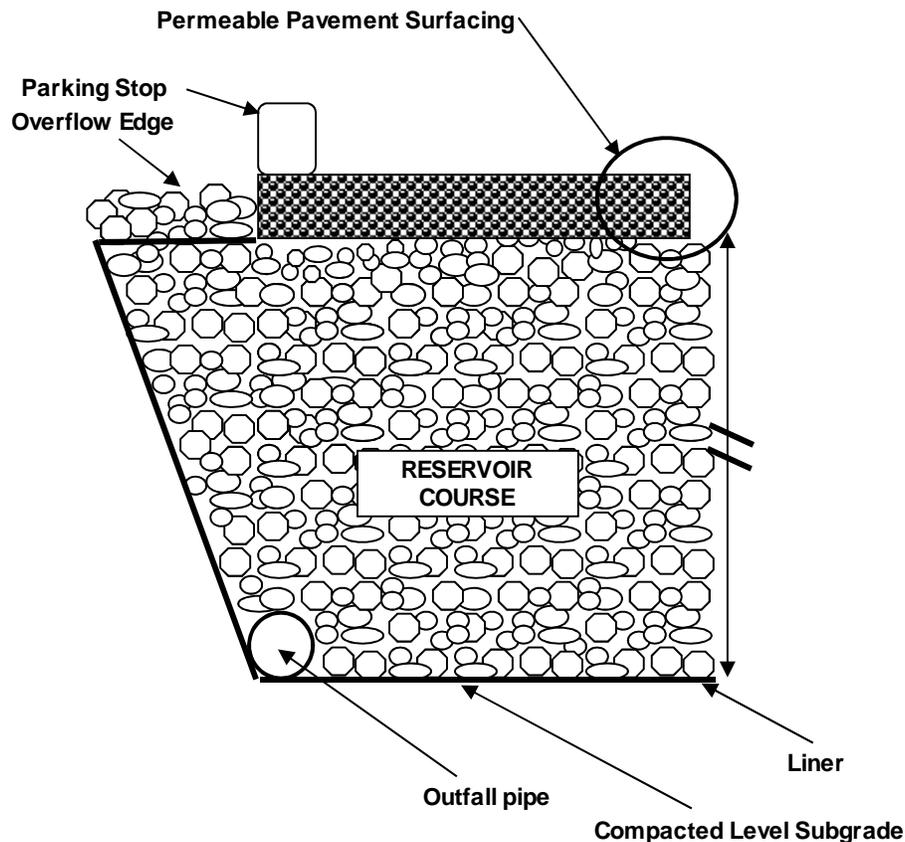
Typical No Infiltration Porous Pavement Section with Subdrain System
